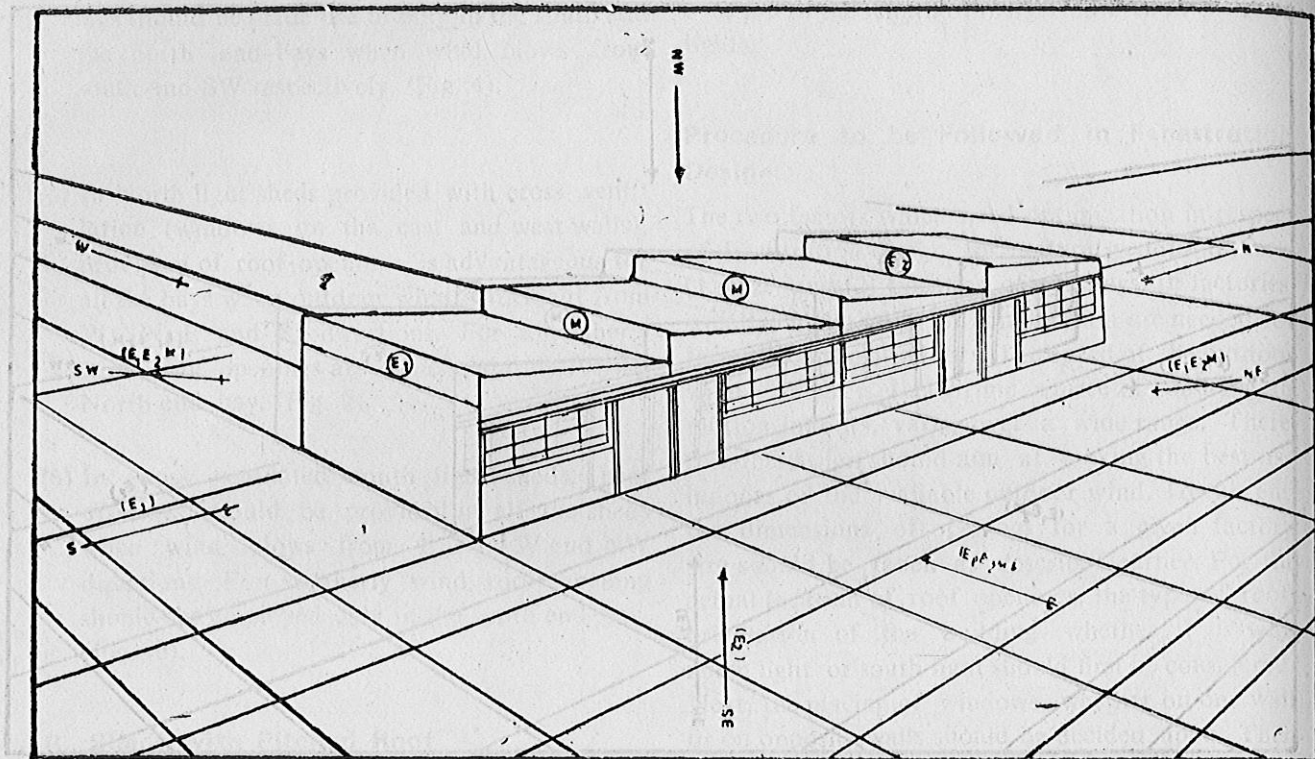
Preferred Location of Roof Openings in Southlight Sheds Having Windows on East Wall Only.
